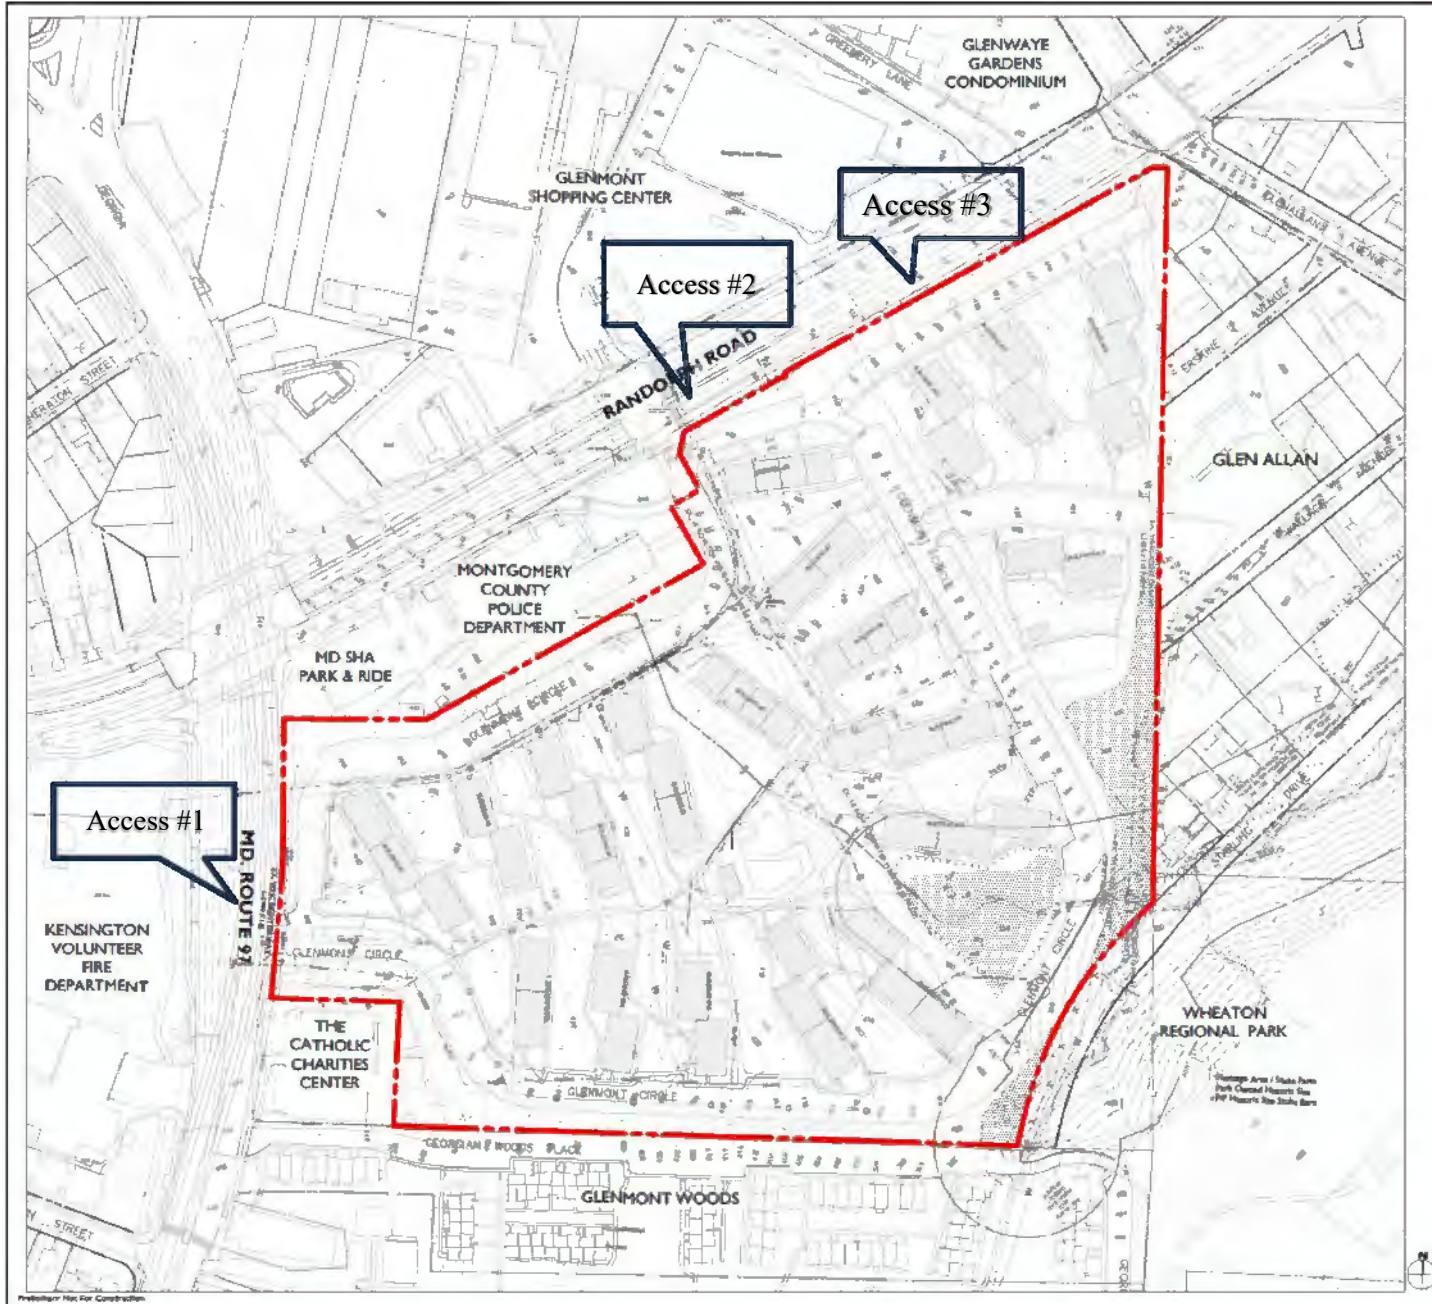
Existing Conditions Site Plan – Access points noted
